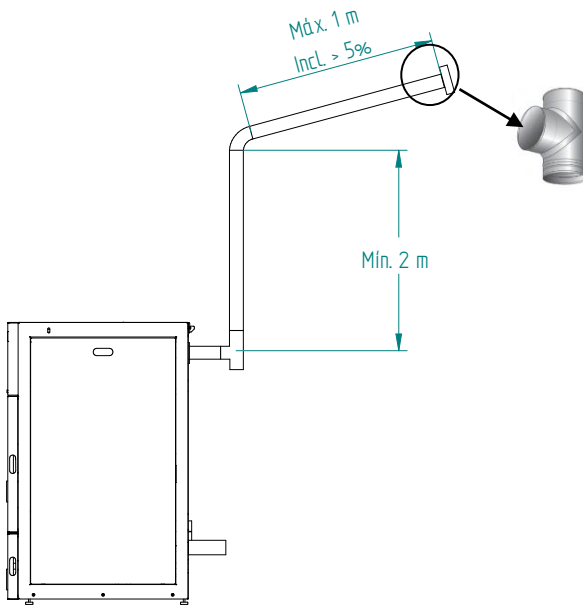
Side view of the boiler installation without a shaft, highlighting the inspection point.
